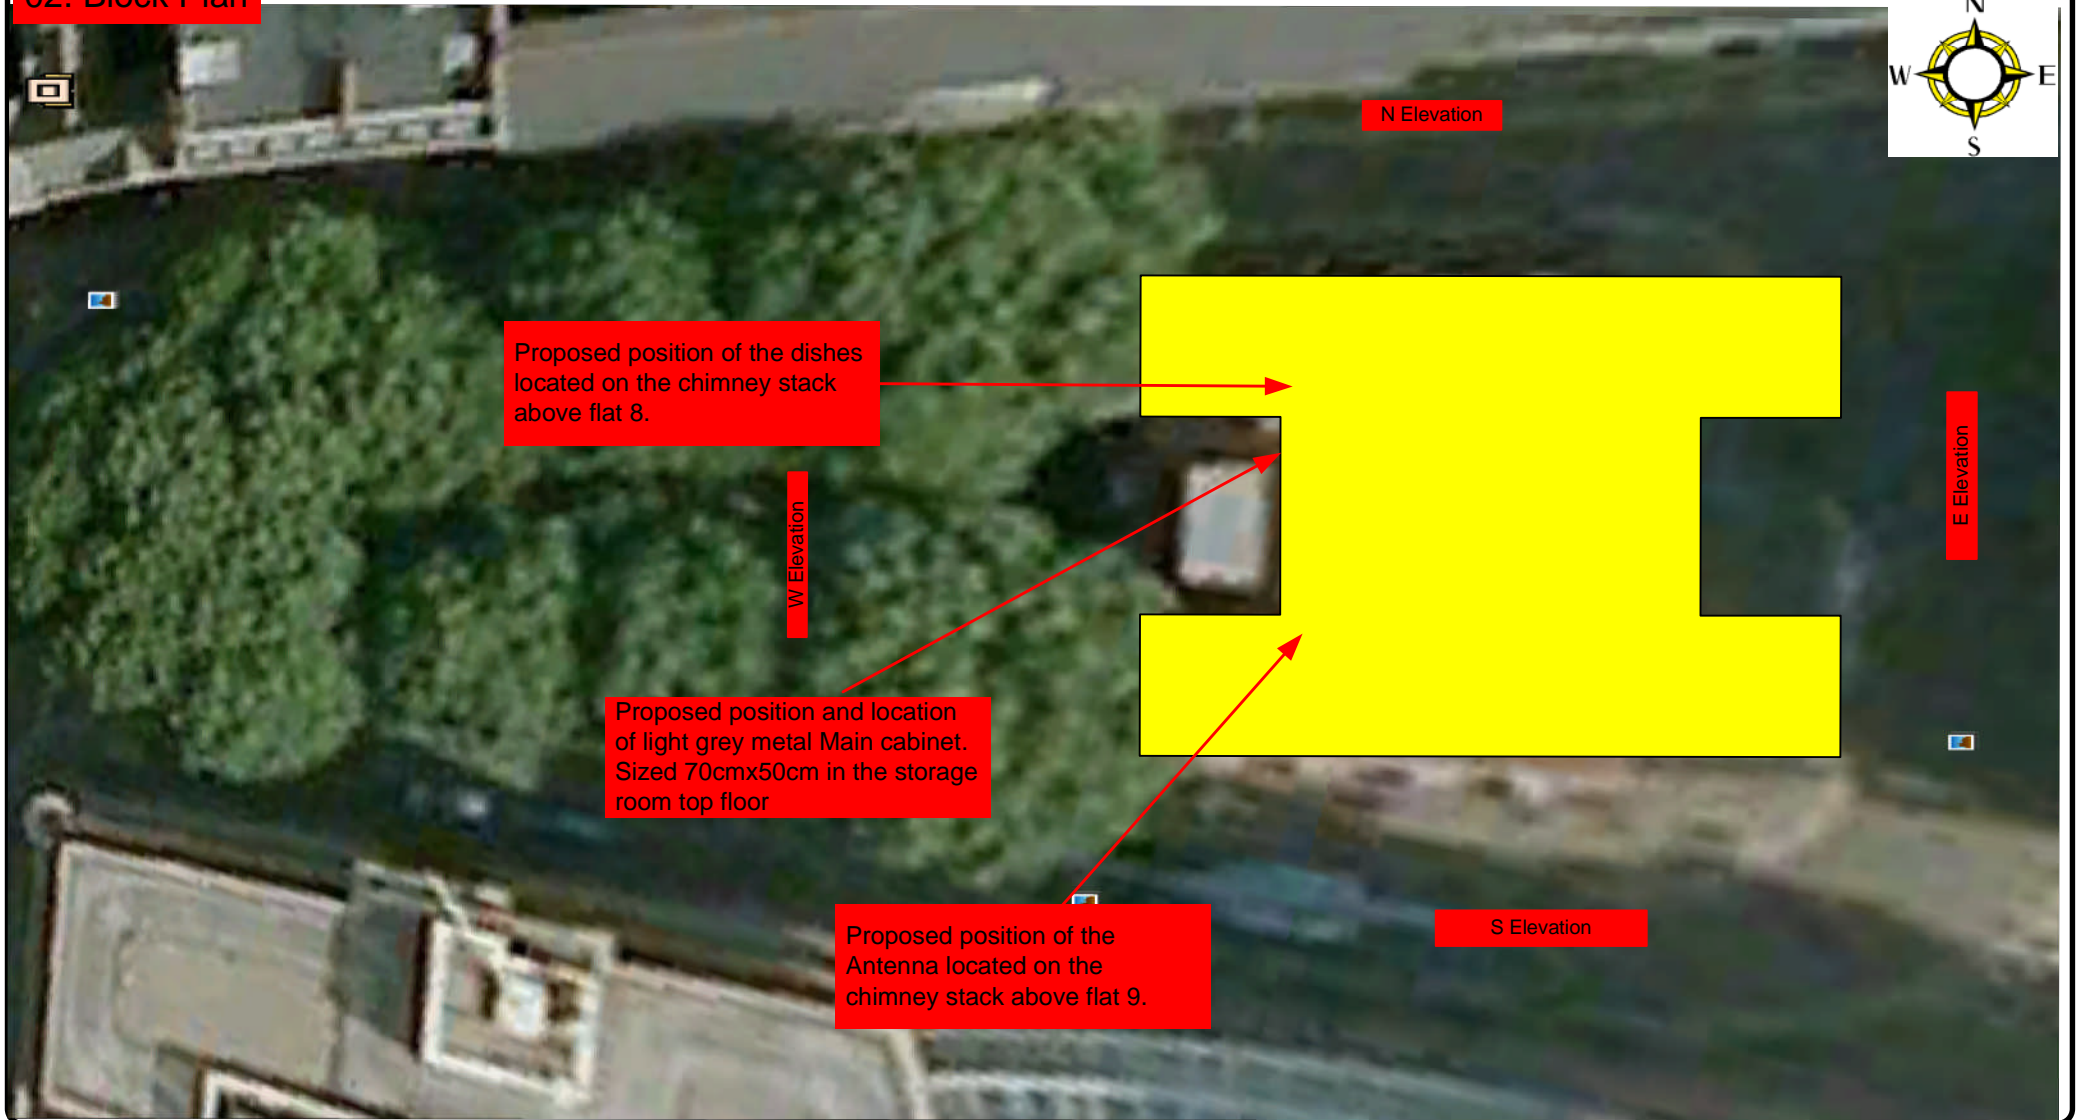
/00	Site Address:	1-10 Cranley Buildings, Dorrington Street, Camden, London, EC1N 7SY
